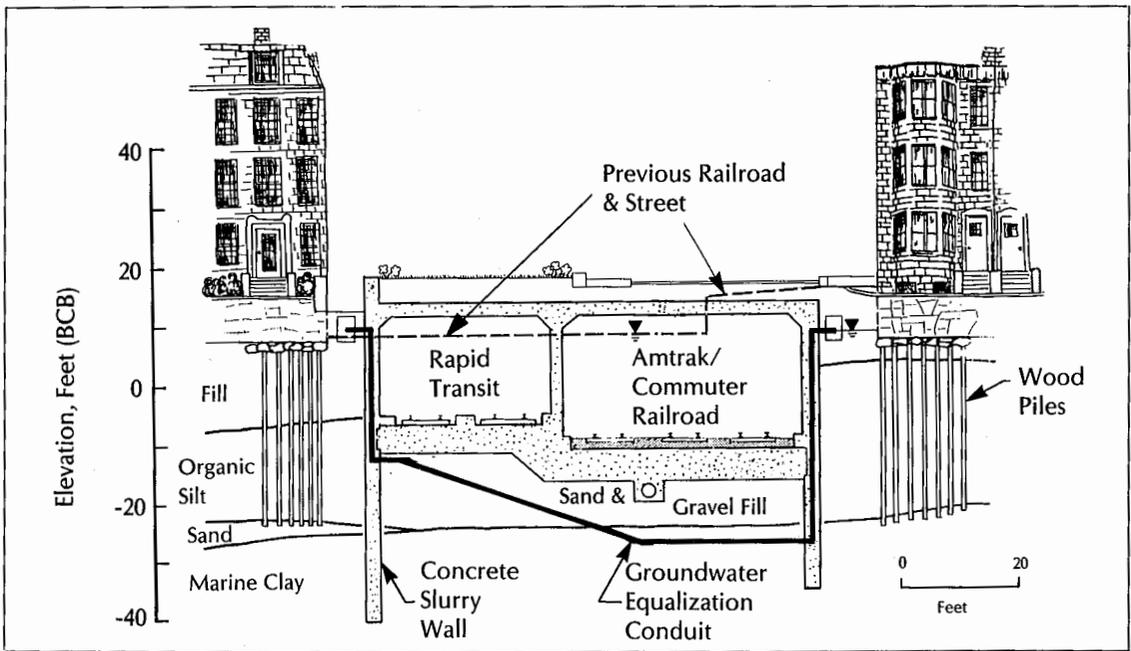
A cross section of the Southwest Corridor Project tunnel, taken at Follen Street.
